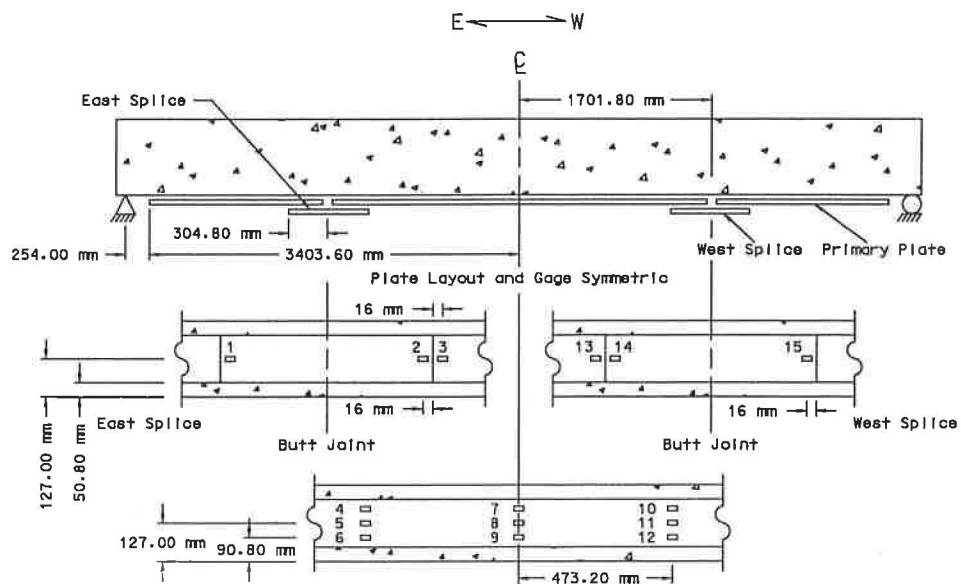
CFRP Plate Layout and Gage Locations, Beam 6 (ULT 2)
